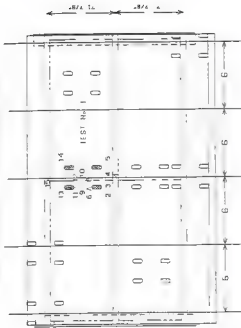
LVDT Locations (Third Bridge - Test No 1)
